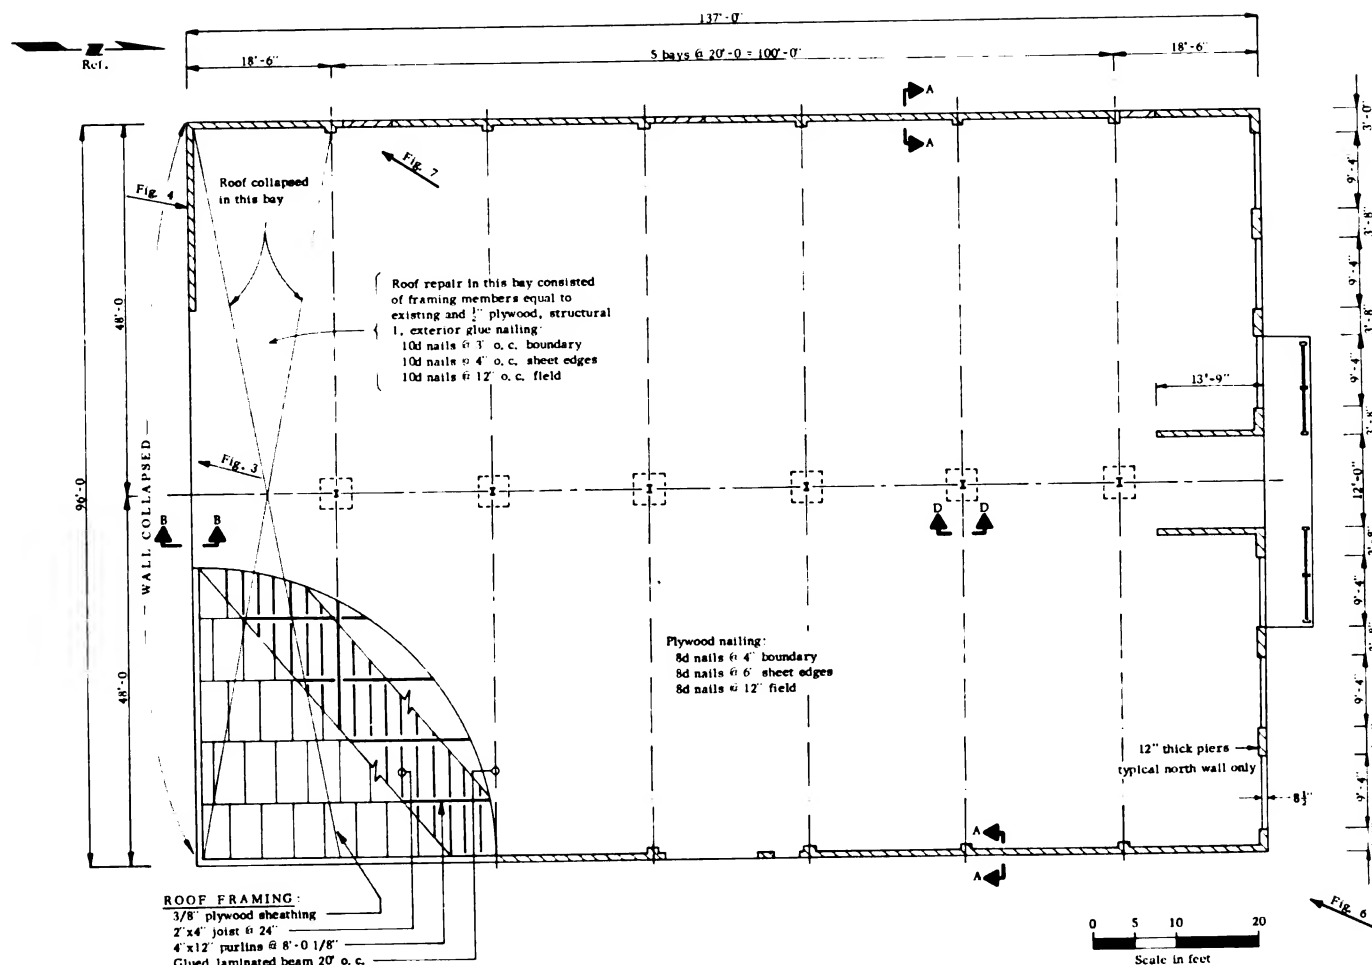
Bell Metrics. Roof framing plan and floor plan.
